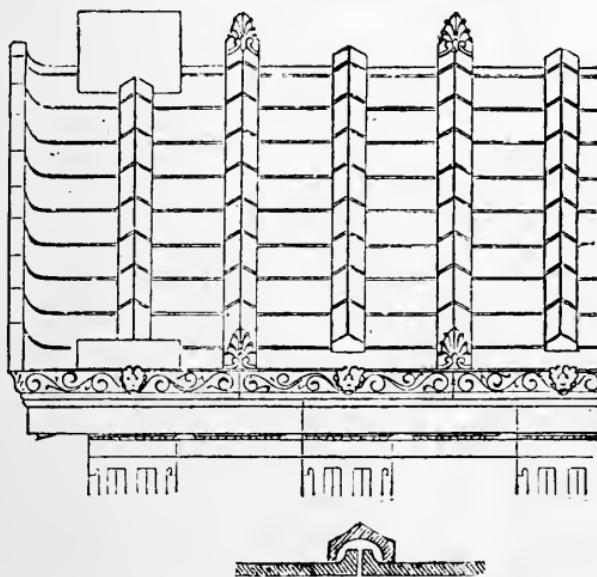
THE ROOF OF A GREEK DORIC TEMPLE, SHOWING THE MARBLE TILES.
